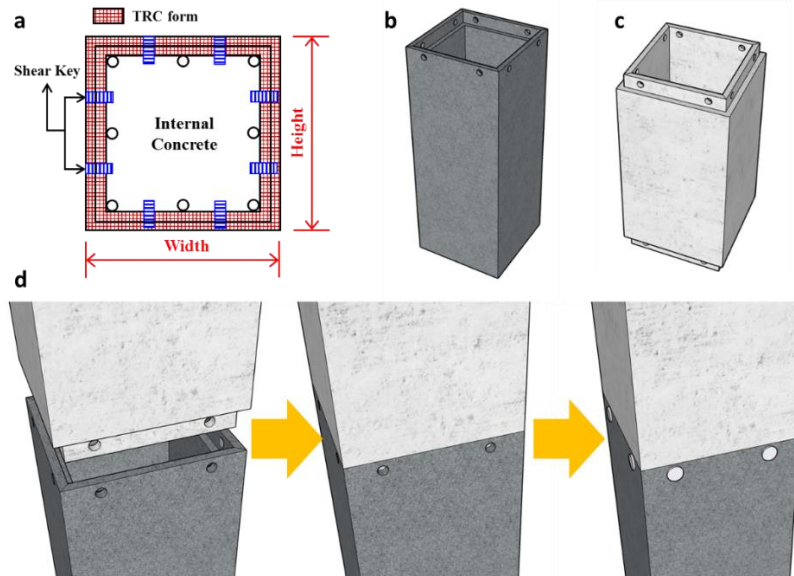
Development of TRC Form Module: (a) section of TRC form module; (b) bottom module; (c) upper module; (d) connection between upper and bottom modules
